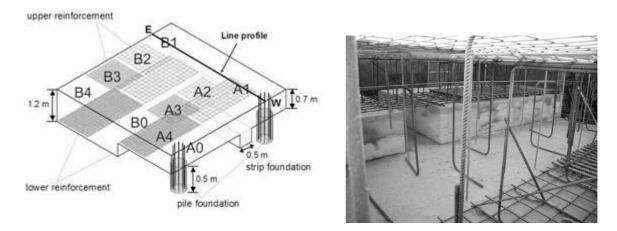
a) Geometry of RuFUS foundation slab and b) lean concrete layer and different levels of reinforcement before placing concrete (cf. [16])
